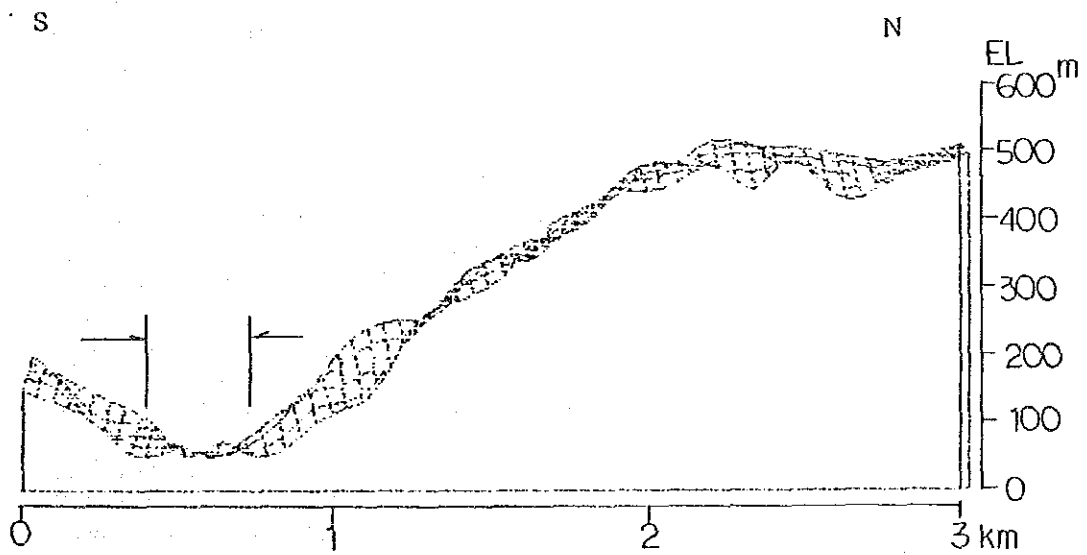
Cross Section along Dam Axis of Bang The Sung Dam Site
